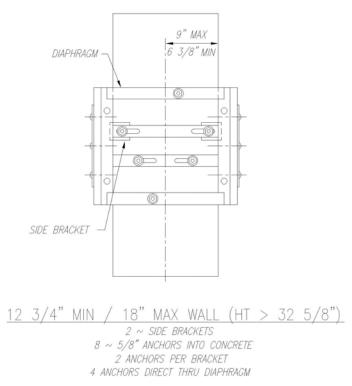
Bolting Diaphragm 10 to Wide Vertical Faced Tall Wall (12 3/4" min to 18" max 7)
